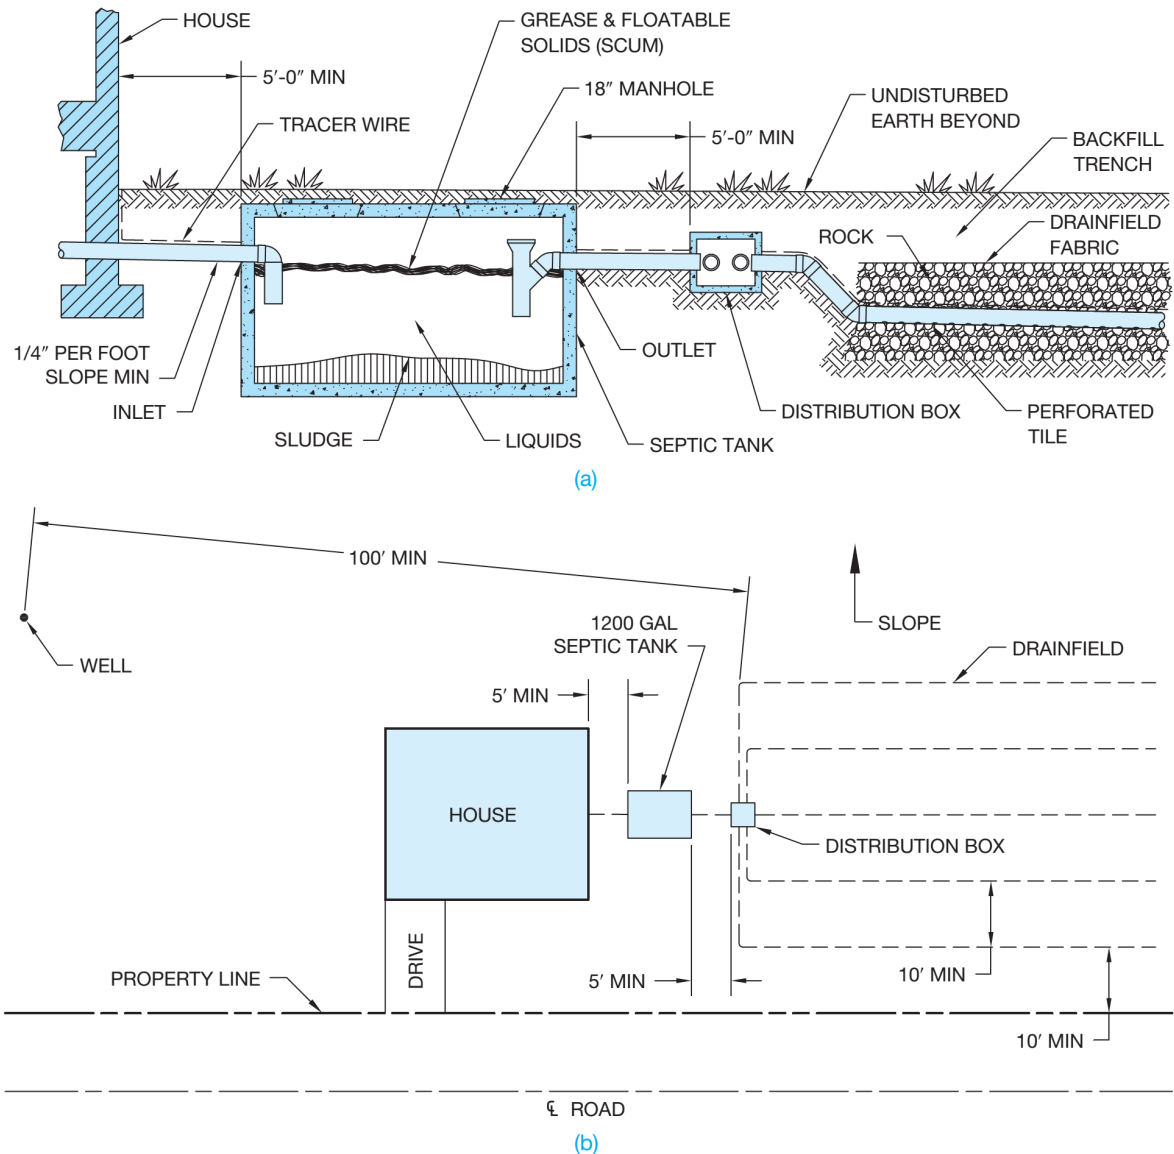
(a) A cross section through a typical septic tank. (b) A site plan showing a house and septic system.
